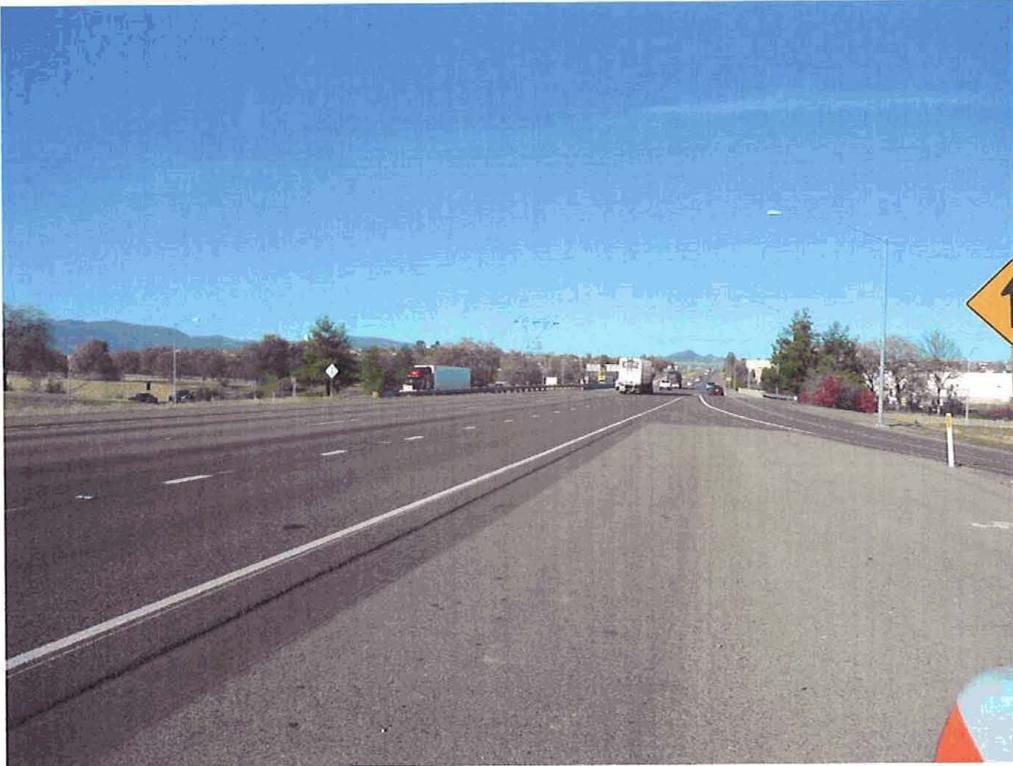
Gore point and NB onramp at East Cypress Avenue UC
